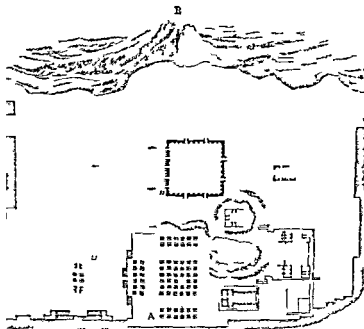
A.—GENERAL PLAN OF THE BUILDINGS AT PER EPOLES.
